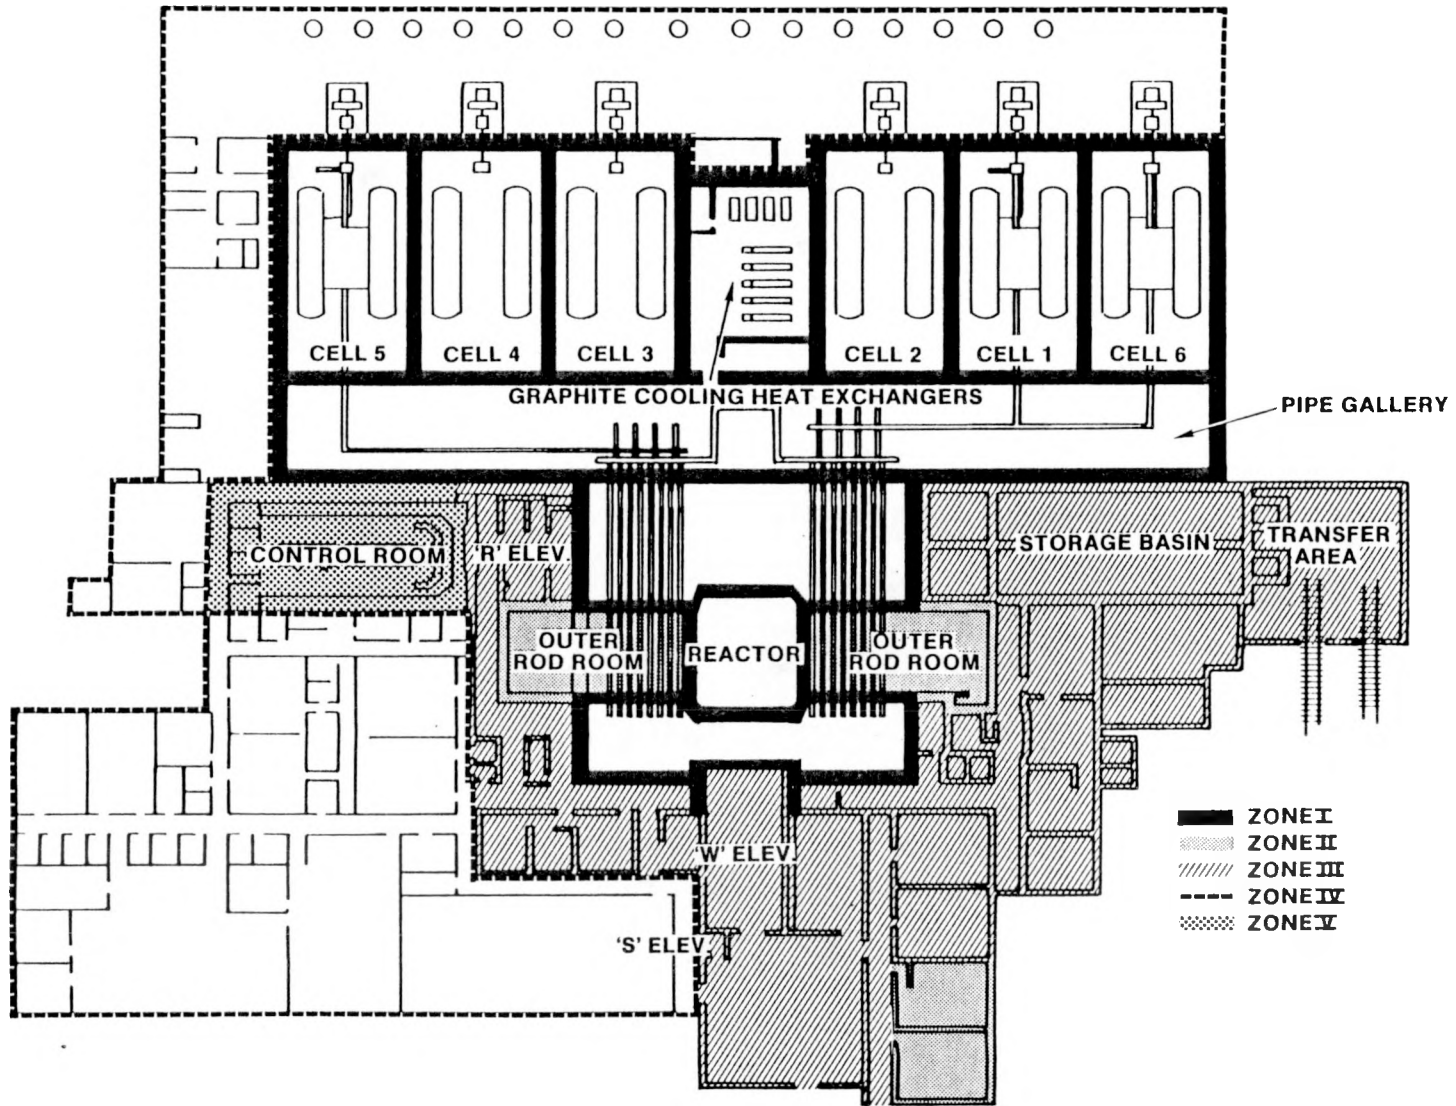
105-N/109-N Plan View Looking Down from 60-Foot Elevation.
